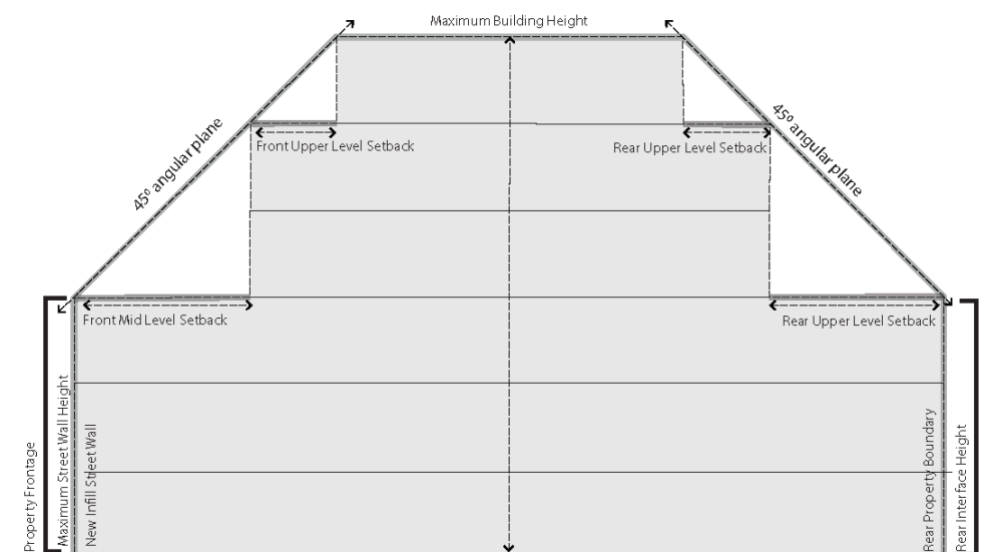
Building envelope requirement – Infill Building (Figure 2 in Schedule 15 to Clause 43.02 Design and Development Overlay).
